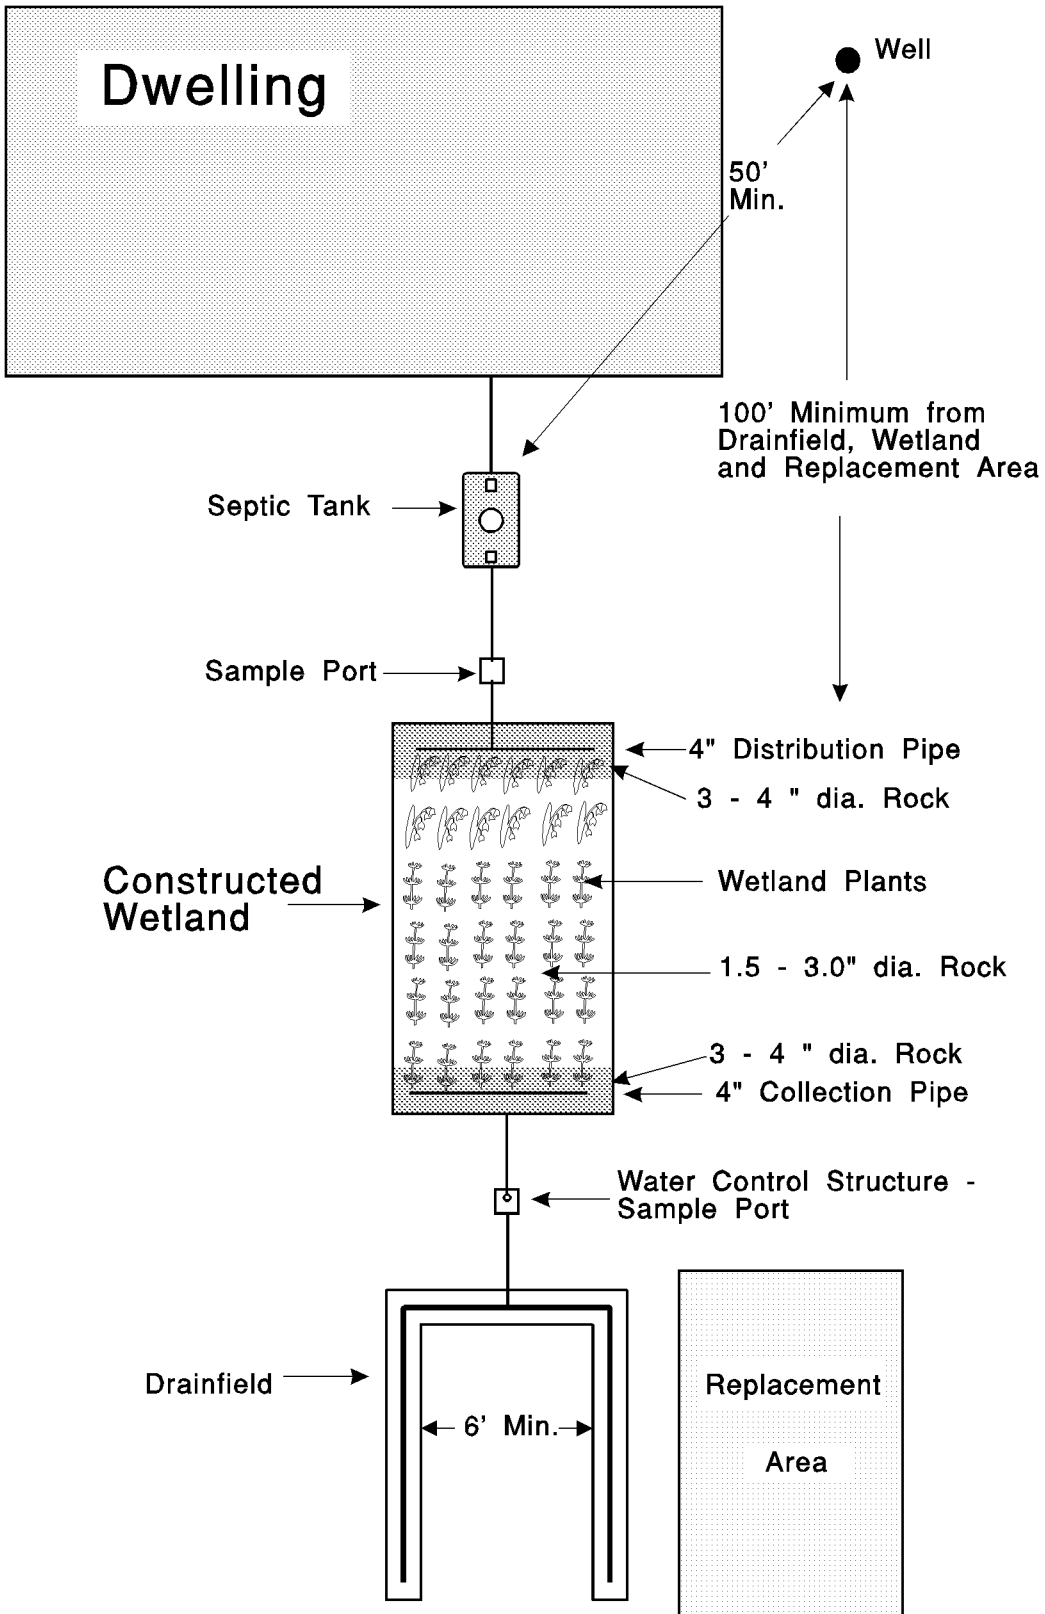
Plan View of Subsurface Flow Constructed Wetland.
